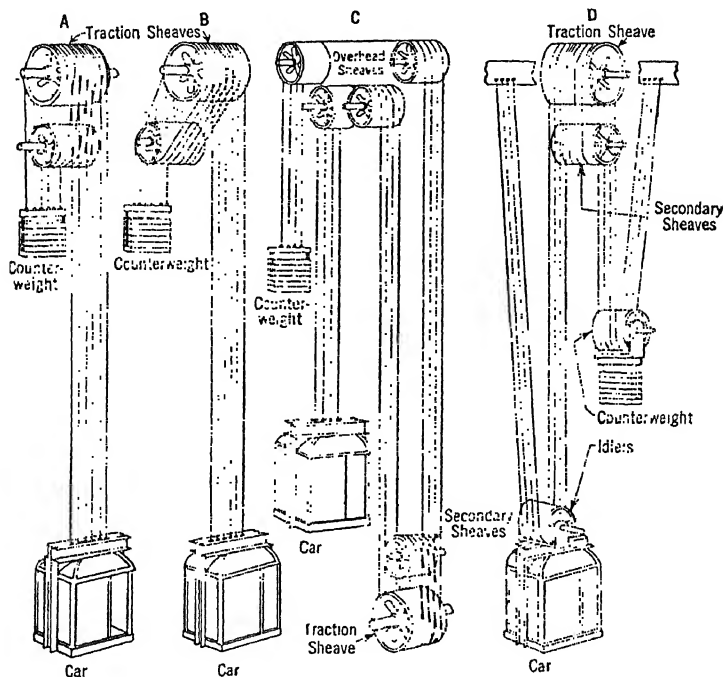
Typical roping for full-wrap traction or cross-over drive lifts.
